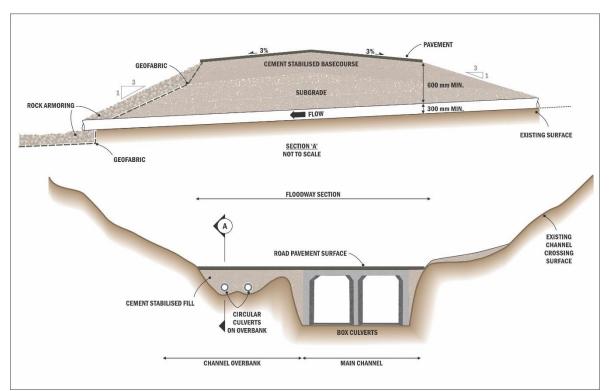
Box culvert and circular culvert and floodway arrangement
